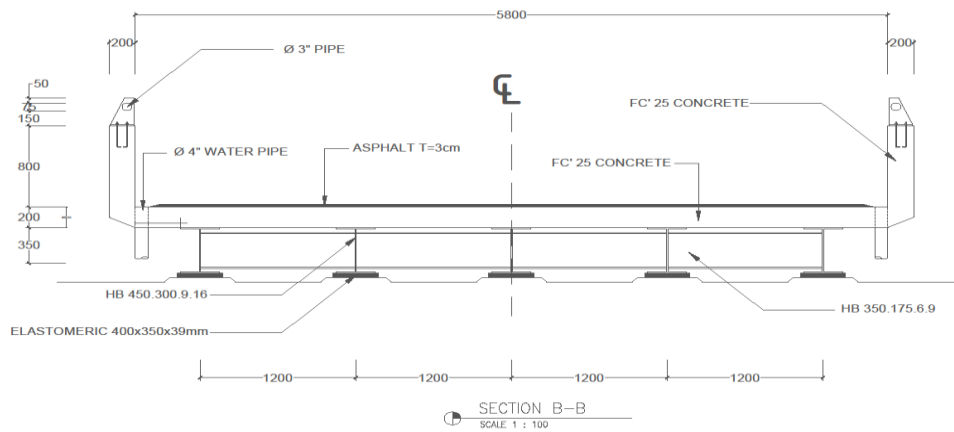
Section of the Kanaan Bridge (Source: CV Elza Jaya Prima)
